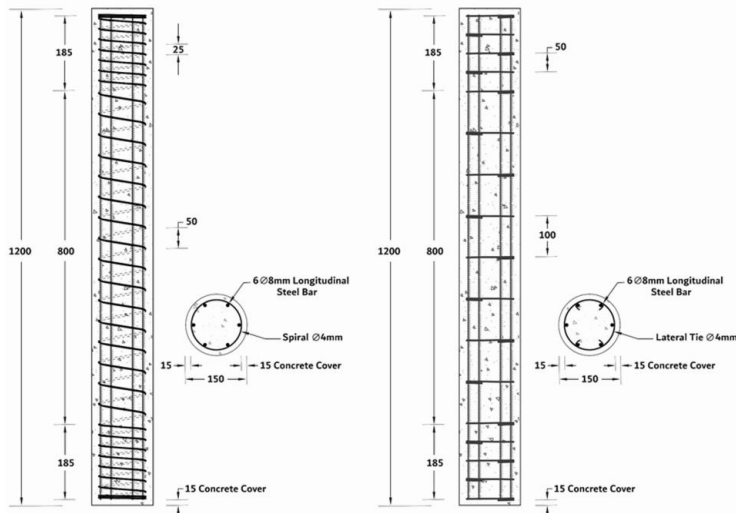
Structural details of slender columns with tied and spiral transverse reinforcement.
